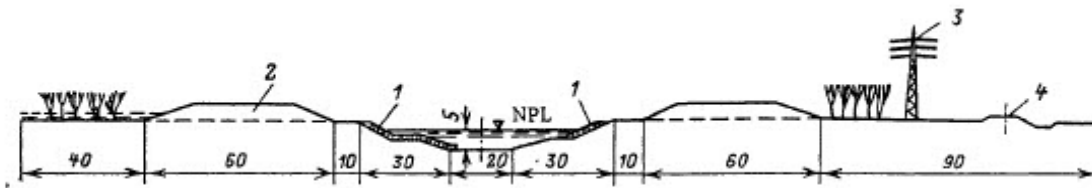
Typical canal cross section. 1) Riprap slope protection; 2) earth embankment; 3) 35-kV transmission line; 4) highway.
